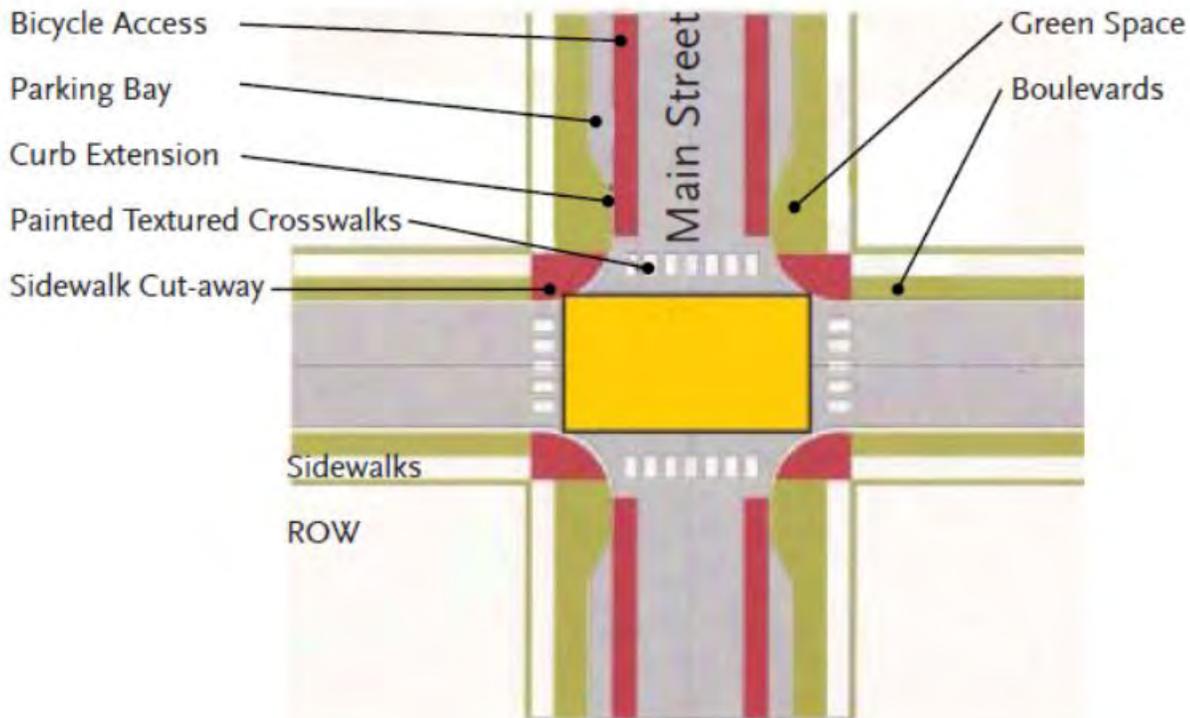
A conceptual engineering layout for Main Street near the WSU campus, showing bicycle lanes and bumpouts on Main Street. Credit: WSU Campus Comprehensive Plan
